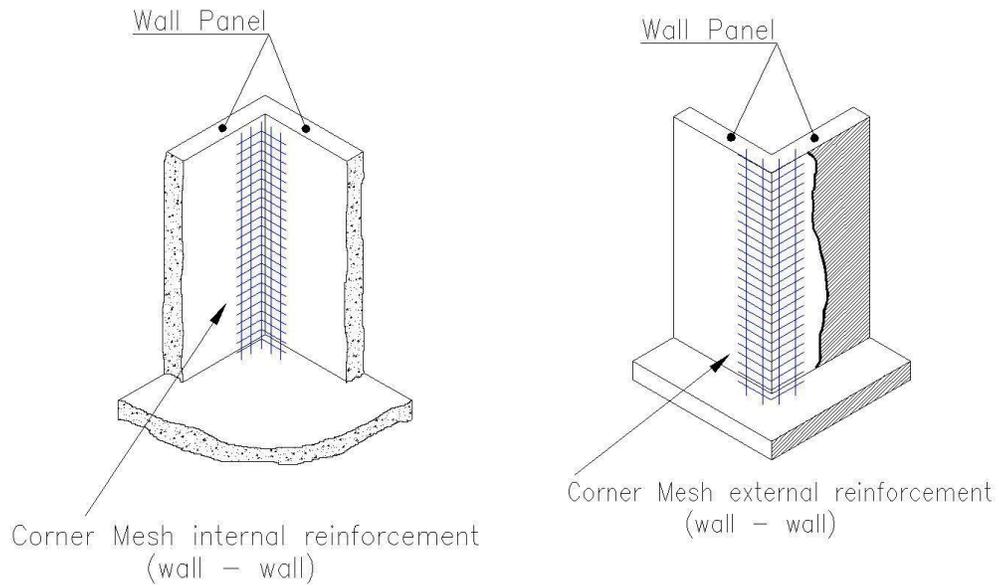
TYPICAL PANEL TO PANEL CONNECTION/JOINT DETAIL
